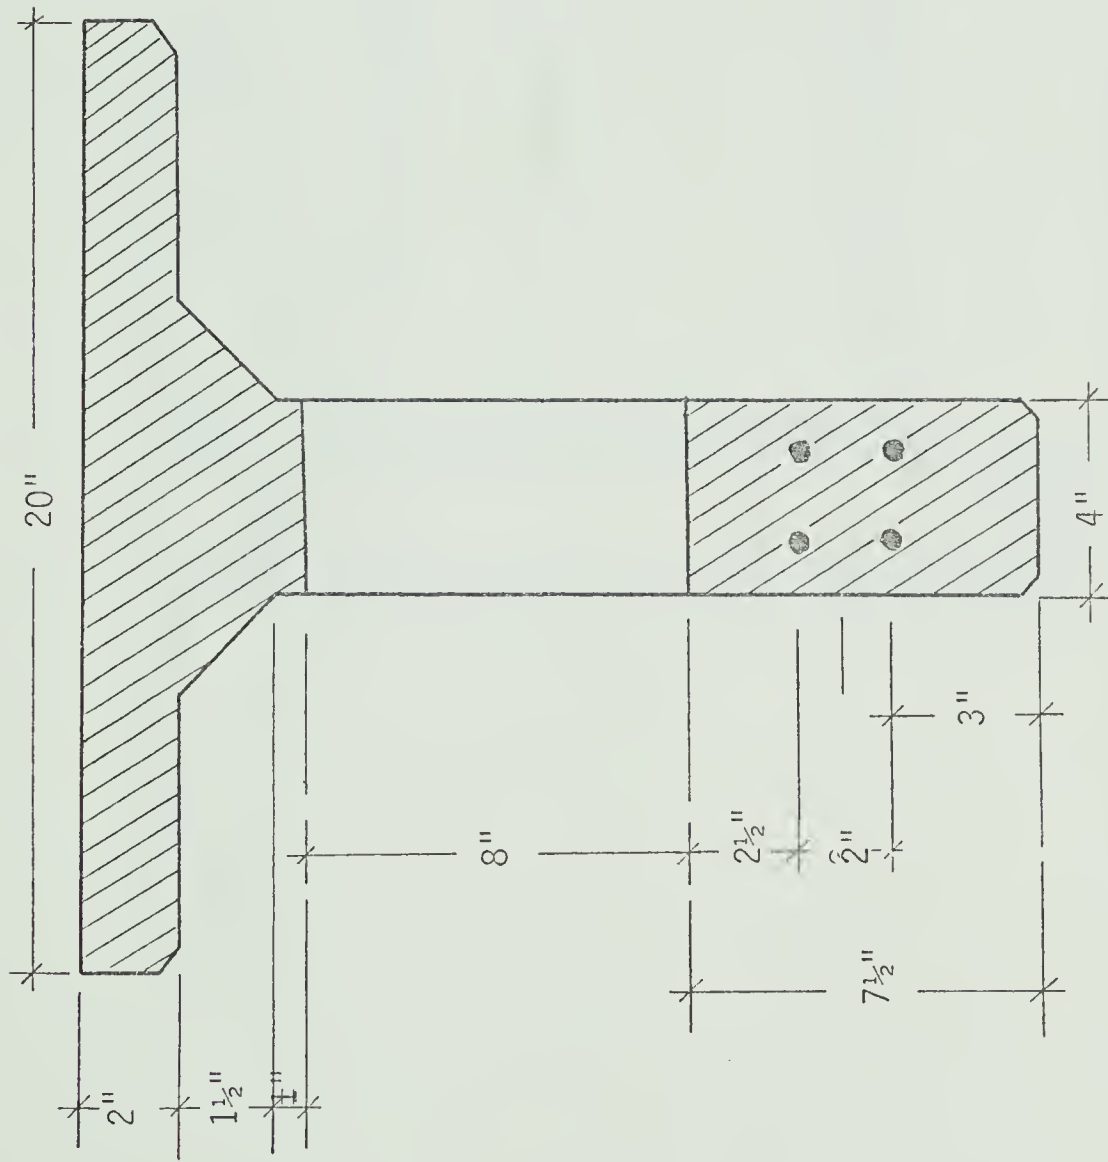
TYPICAL CONCRETE X-SECTION AT AN OPENING
